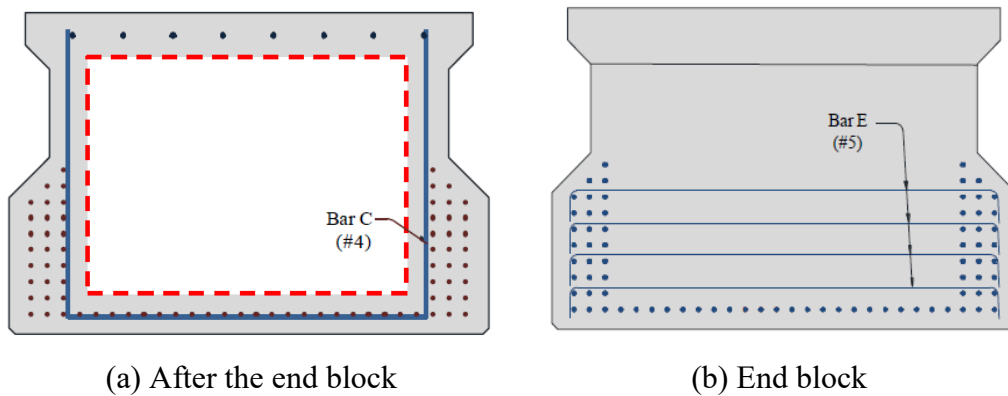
Reinforcement detail and debonding pattern for the specimens (5B40)(Avendano et al. 2013)
